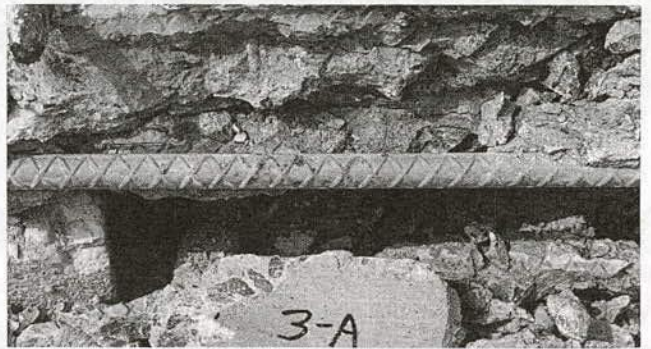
Fall 1981 condition of top rebar. FHWA 1974 Slab 3—Scotchkote 202 coating meeting specifications, no deliberate damage.
